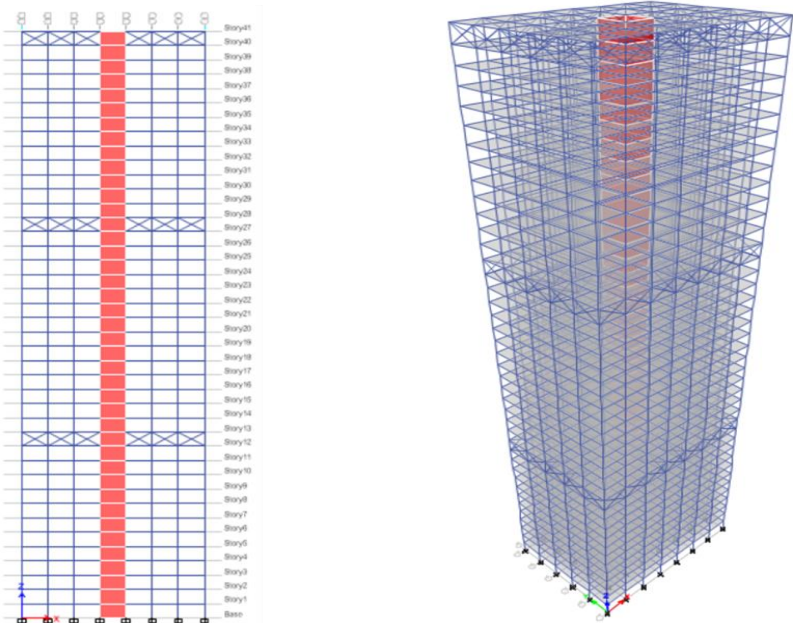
Model of G+40 Building with outrigger using X type bracing positioned at 12th, 27th, 41th Story
